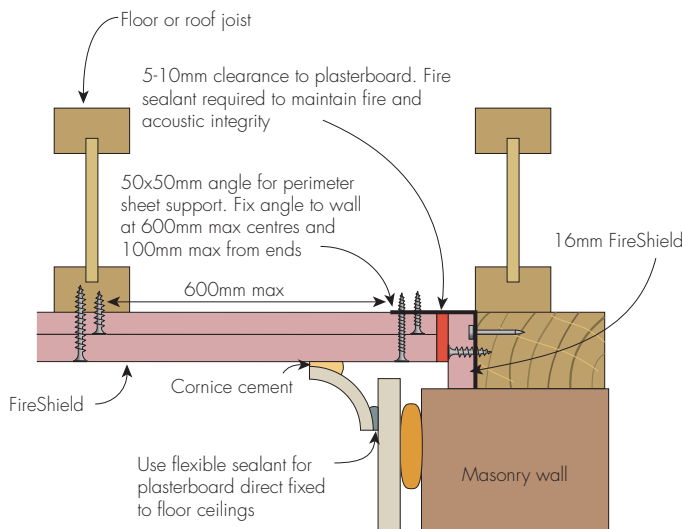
Fire Rated Ceiling to Masonry Wall – Alternate Detail
